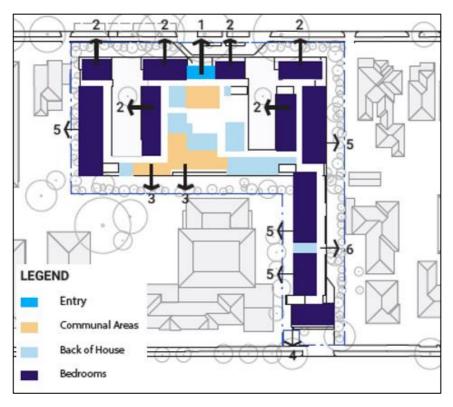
Proposed Location of Uses Source: O'Neill Architecture
